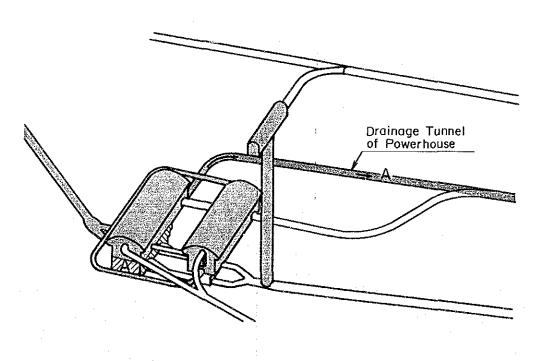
Construction Procedure Surrounding Powerhouse
